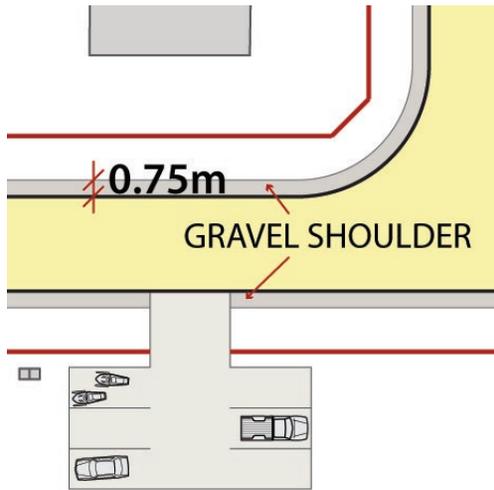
Gravel shoulders of at least 0.75 metres width should be incorporated into all local and collector road designs.
